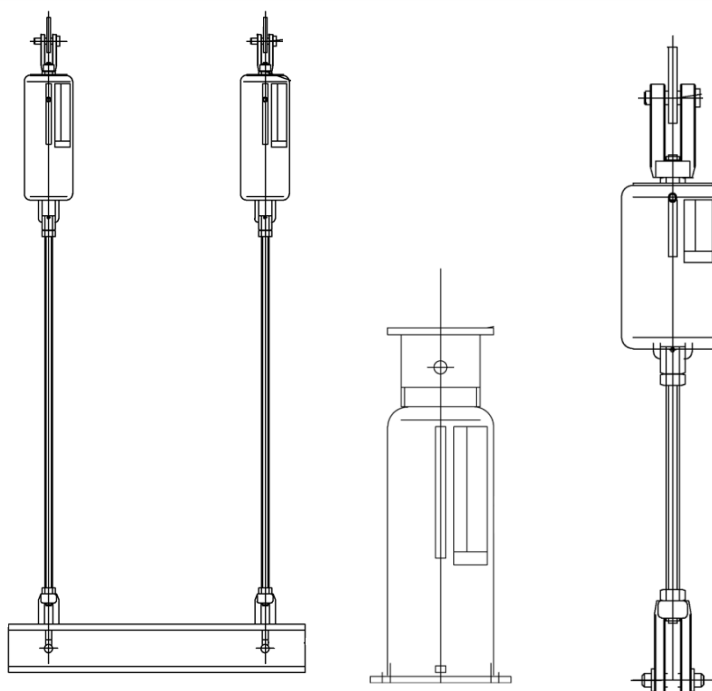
Drawings of the piping support. The spring can hangers will be welded to the support steel underneath the mezzanine.
